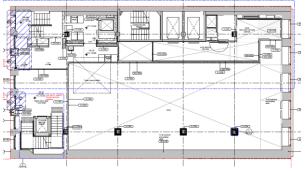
Beneficial House—Floor Plan, Wynyard Lane level—showing proposed new stair and lift. (Source: Make + Architectus, A-285-11-05-0, 17 April 2019)
